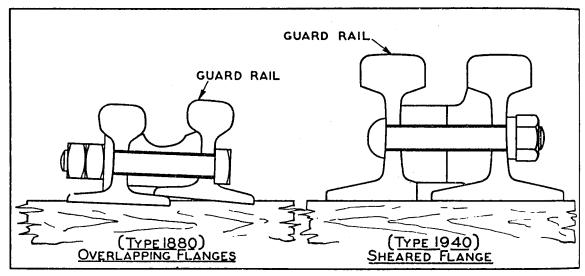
ARRANGEMENT OF GUARD RAIL FLANGES.
